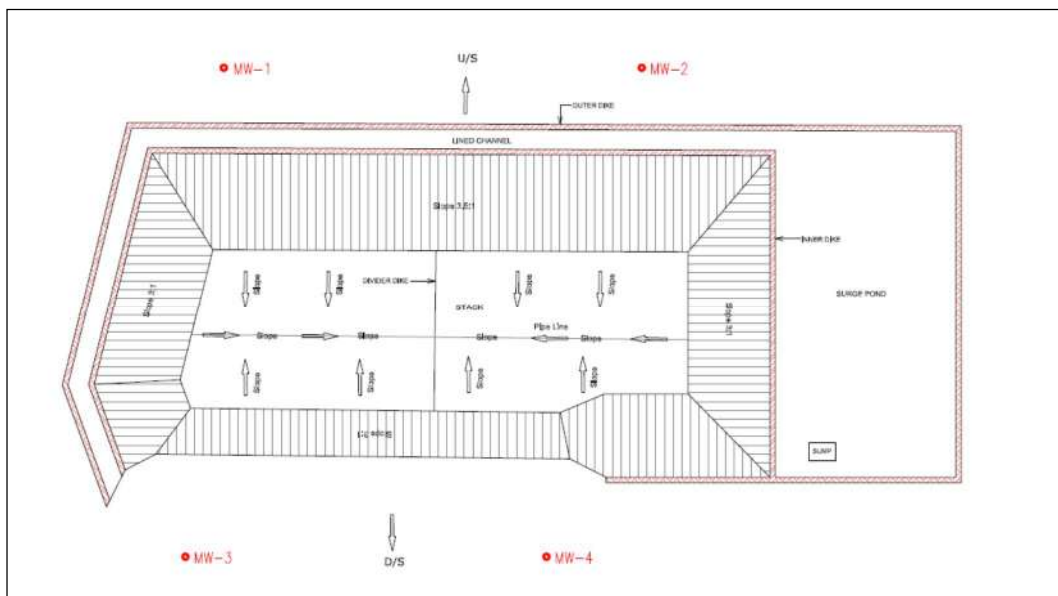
Typical layout of the stack area, leachate Channel and surge pond
